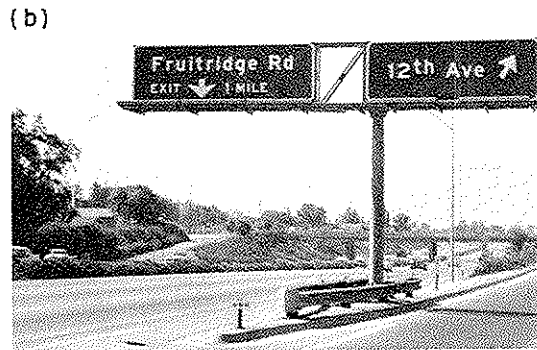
(a) Fixed object (wood signpost) less hazardous than guardrail protection; (b) fixed object more hazardous than guardrail protection.
